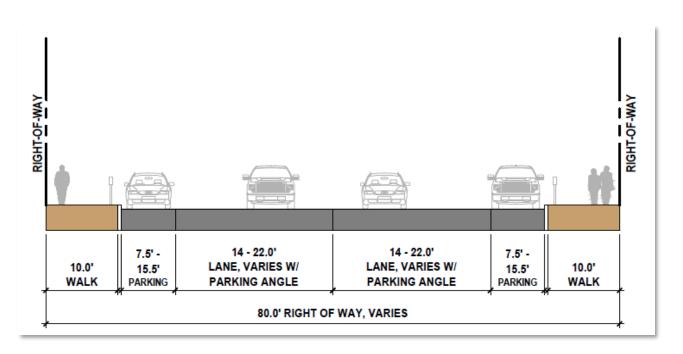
4th St - Existing Cross-Sections Between Colorado Ave & Rood Ave
